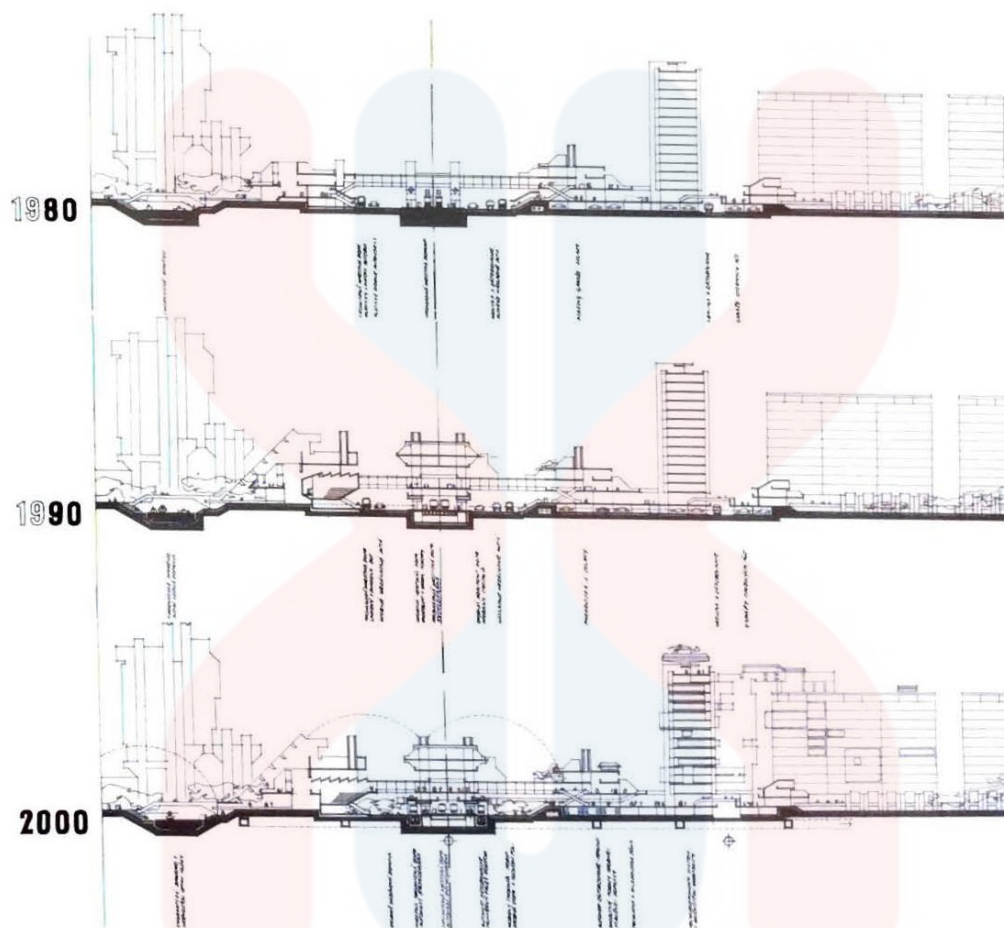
A cross section shows the conception of metro line along the central north-south boulevard, elevated walkways connecting to residential buildings, and central hub with futuristic architecture and how the buildings would have added features over time.
